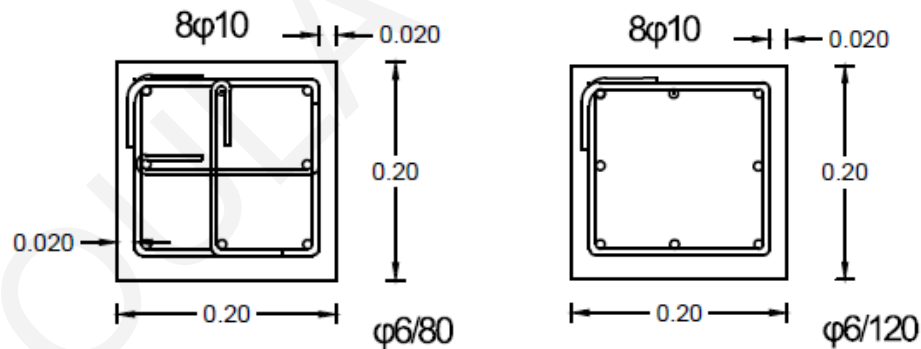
Stirrup detailing for (a) Member A: Control and (b) Member B: SHFRCC
